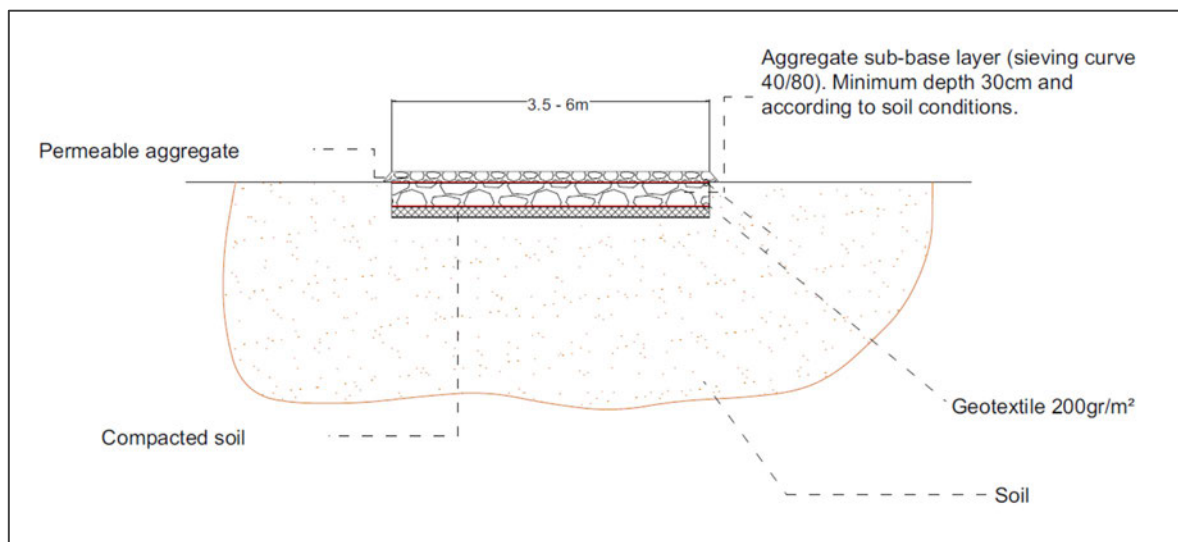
Internal Access Road Detail (Extract from Drawing No. DX-01-P05)
